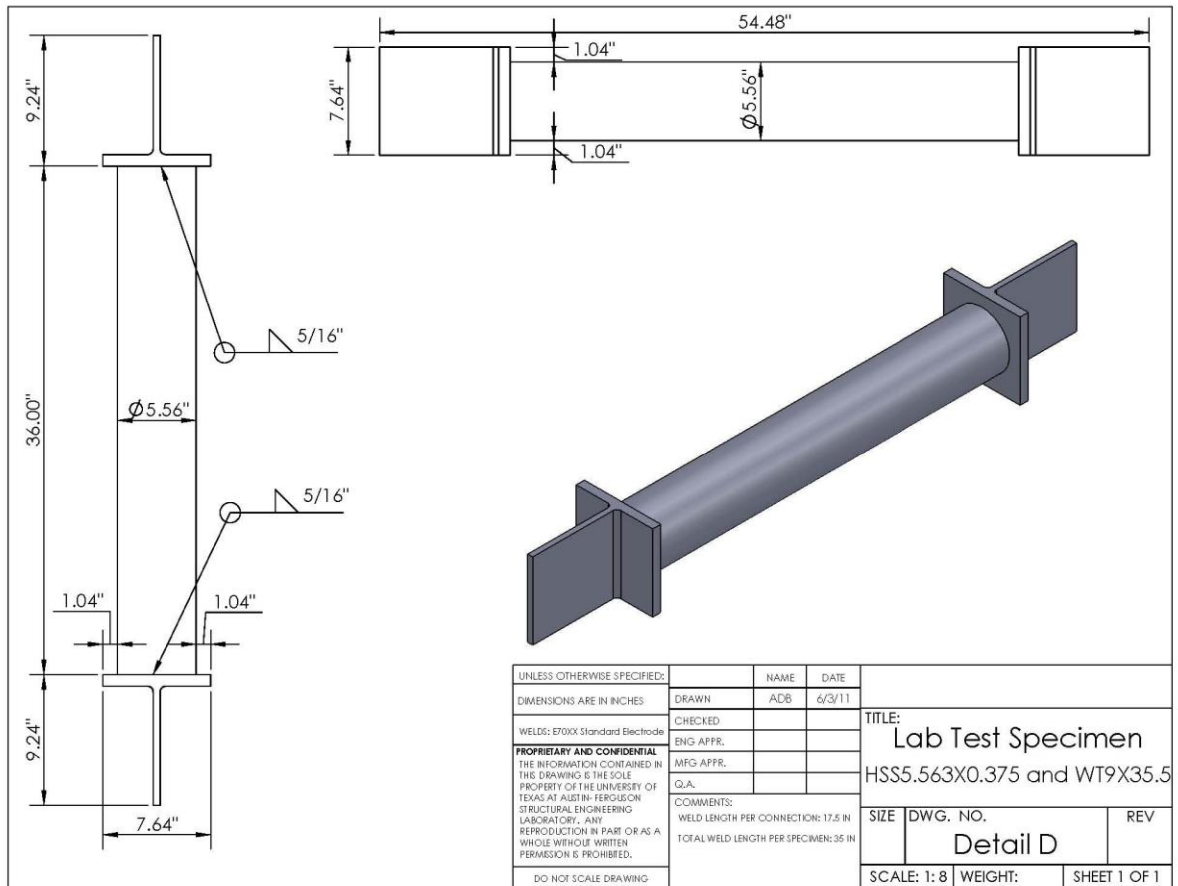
Round HSS Specimen with T-Stem Connection Detail
